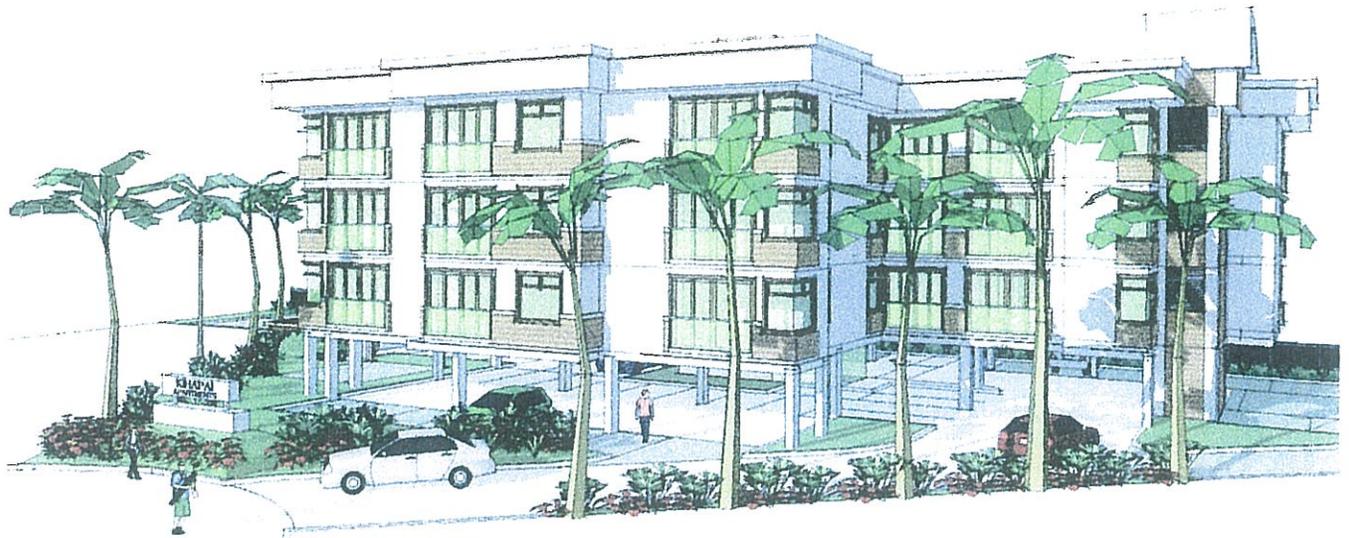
Kihapai Place Apartments (Northeast Perspective)
